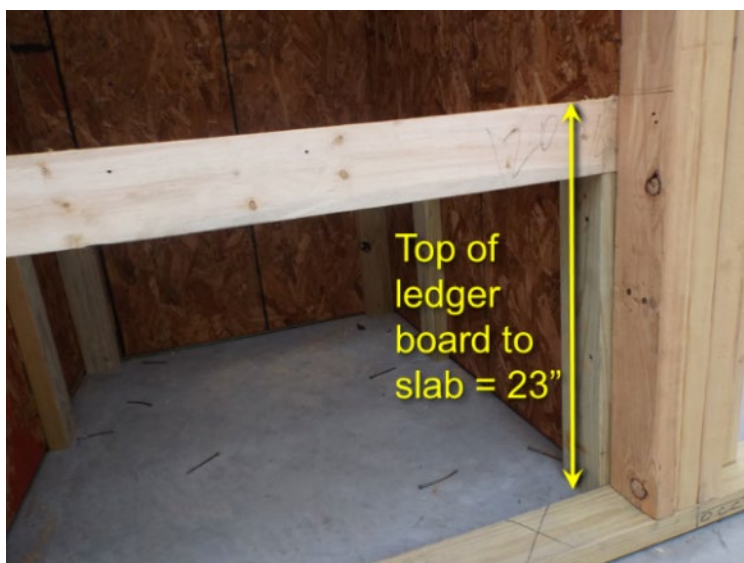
Supports and Ledger Boards for HVAC Unit
